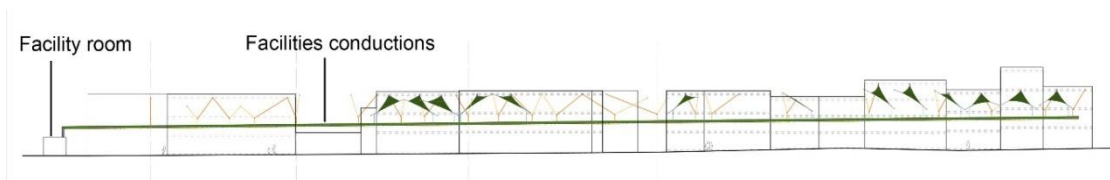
Zúñiga Street Elevation plan - Green Shady Structures (Source: SingularGreen).
